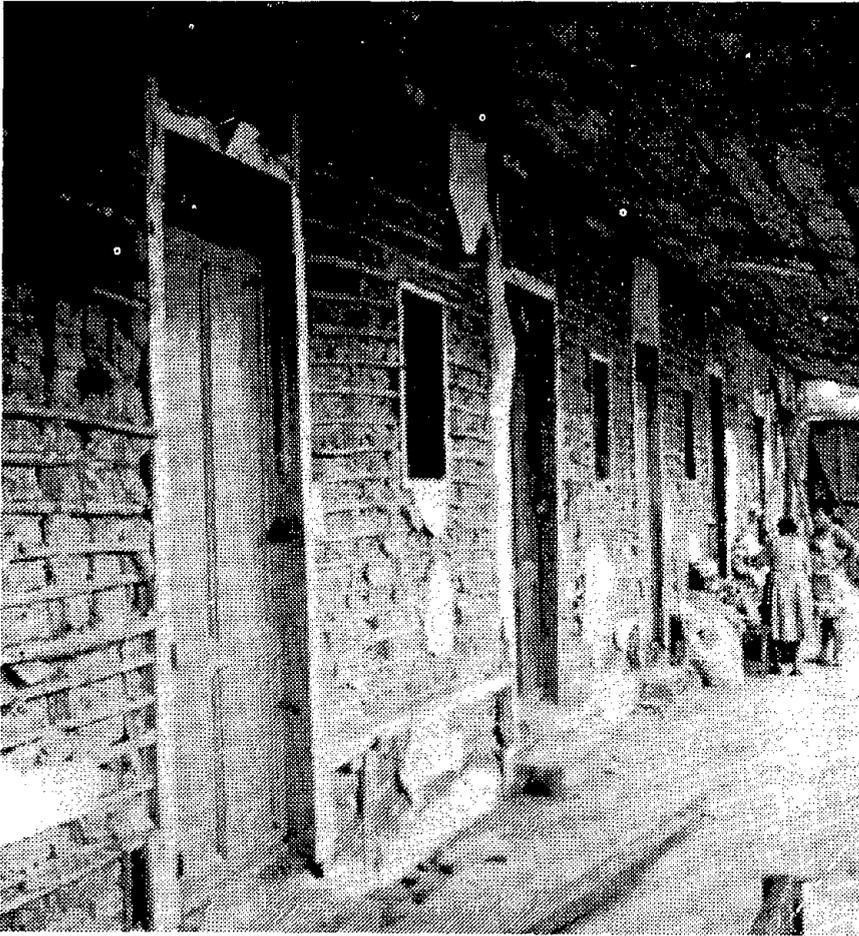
BAHAREQUE CONSTRUCTION IN EL SALVADOR AFTER THE 1986 EARTHQUAKE. The racking from the earthquake caused all of the stucco to fall off, but left the building standing.
